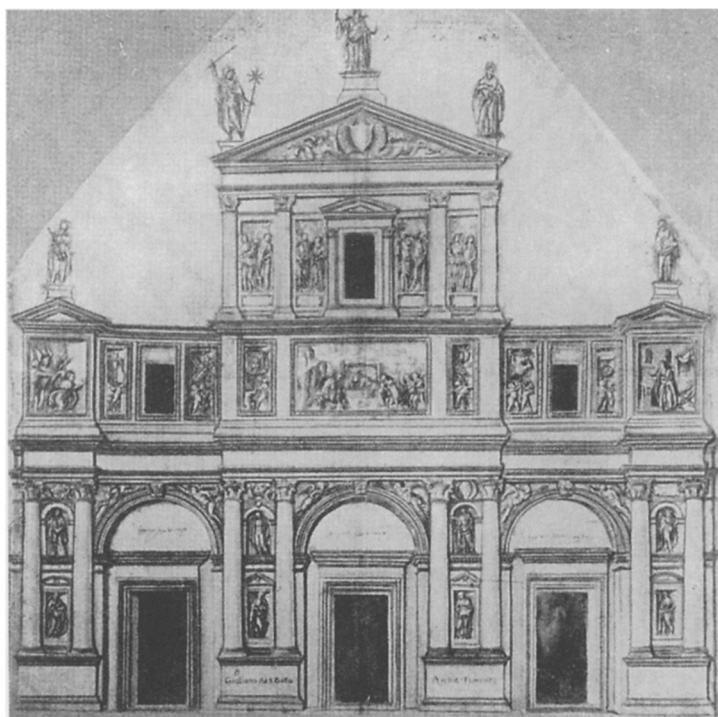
Giuliano da Sangallo, Uffizi A280, elevational study for the S. Lorenzo façade (Gabinetto Disegni e Stampe degli Uffizi)
